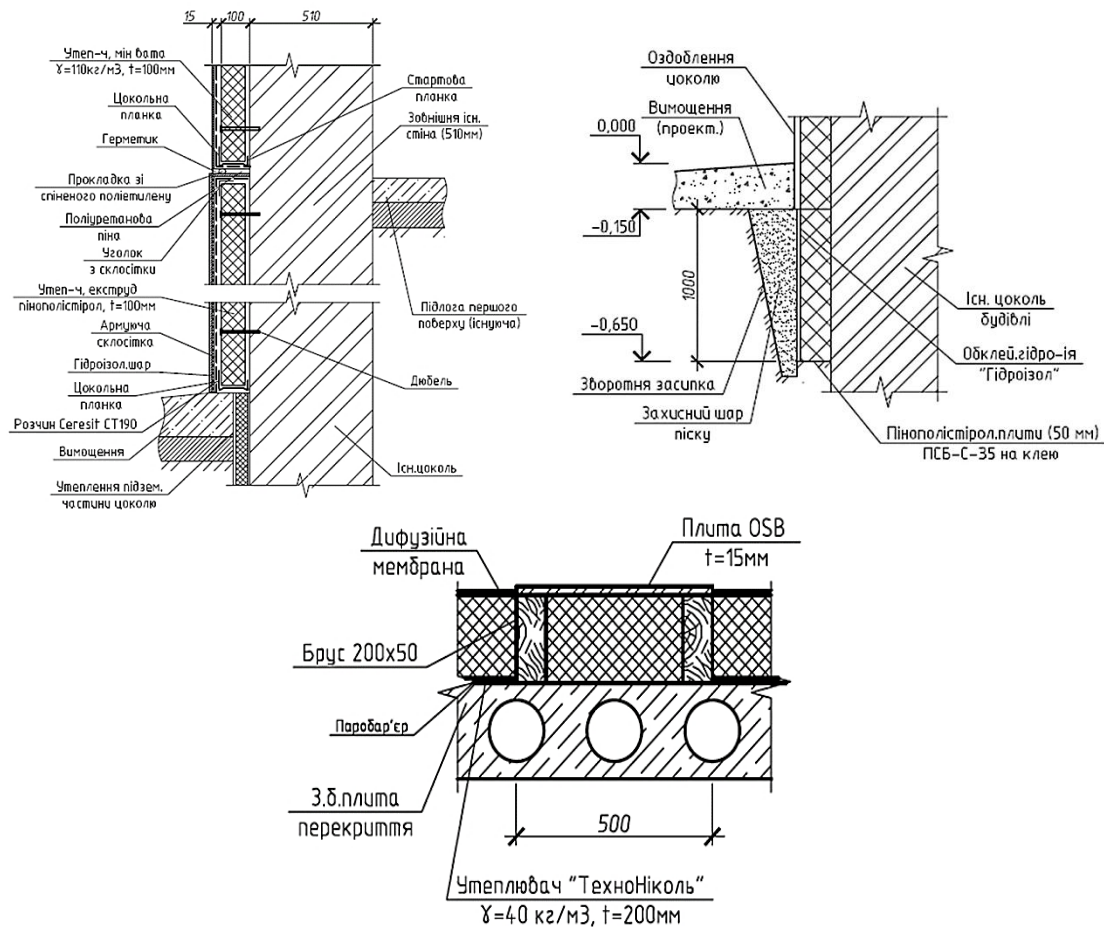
Approved design for insulation of exterior walls, foundations, and floor slabs
